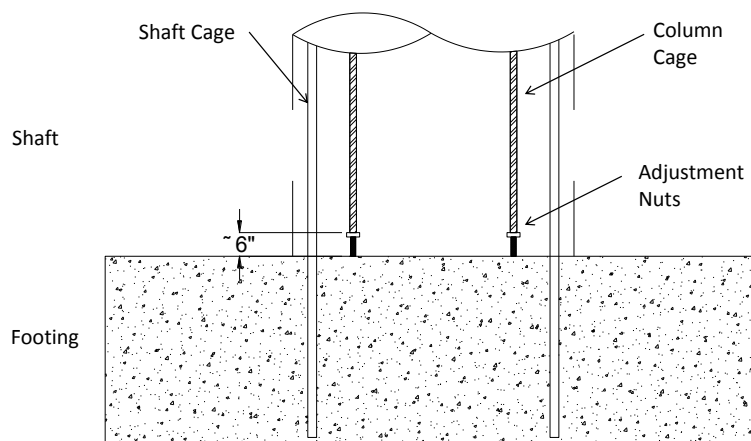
Sketch of adjustment threaded bars used to place the column cage.
